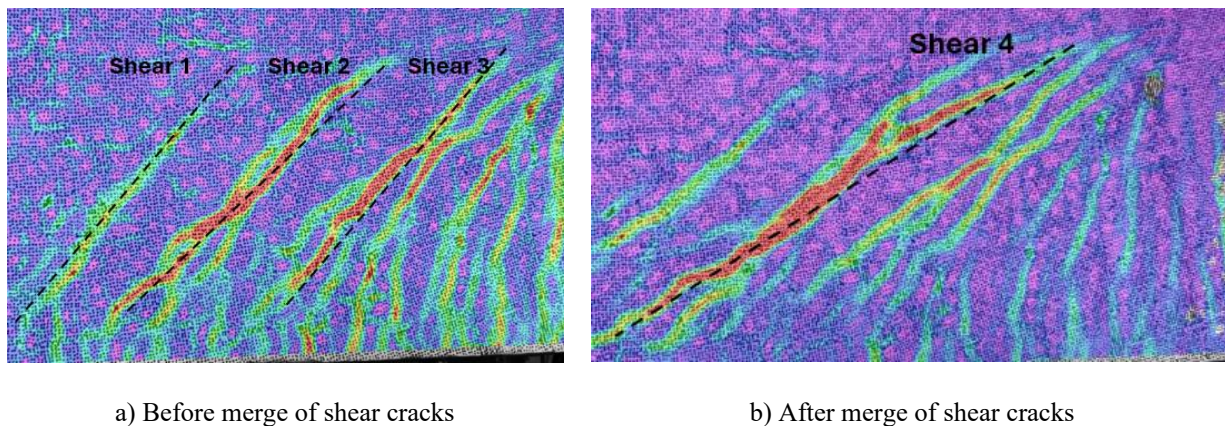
Critical shear crack angle from girder G4
